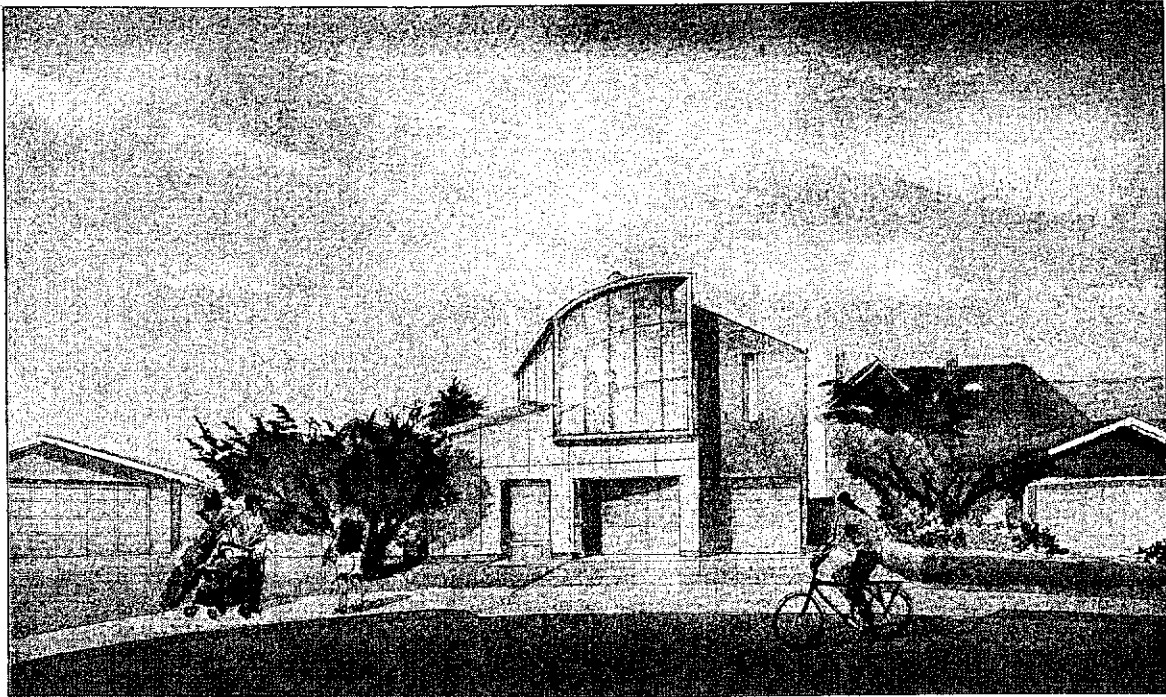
Proposed Porter House, north elevation. *Watercolor by Robert Becker.
